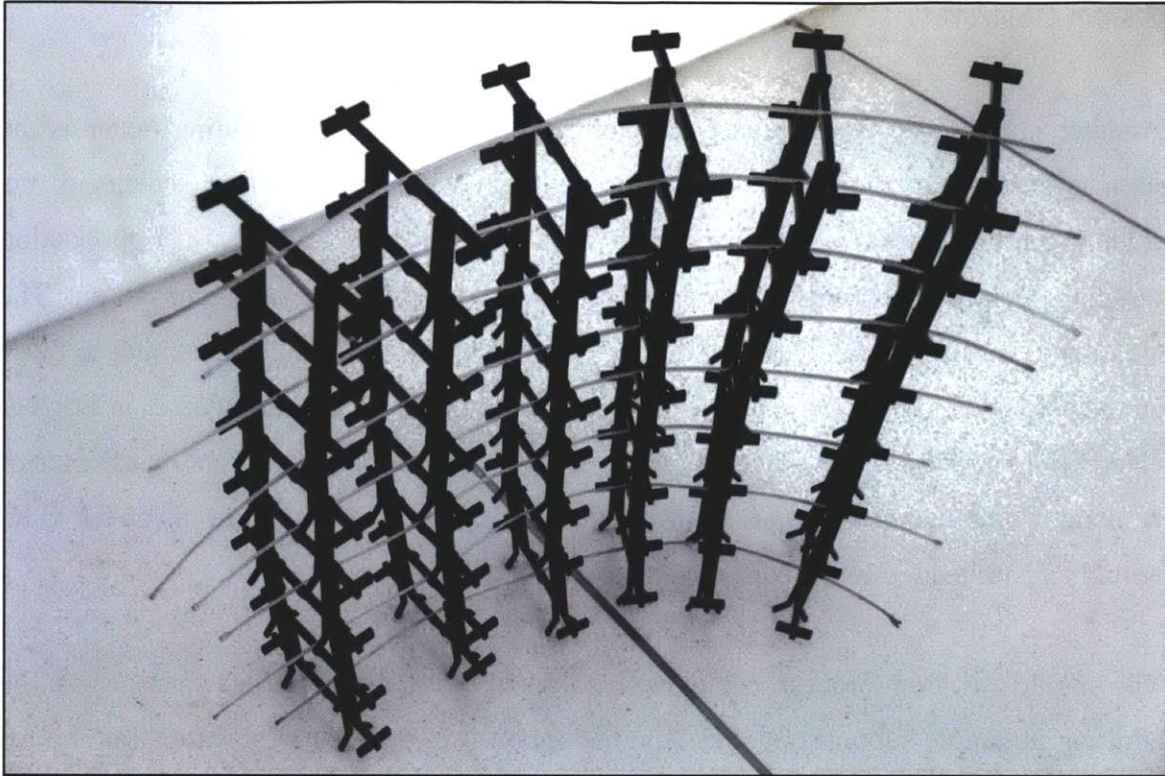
An example reinforcement system that could be integrated into the printed mould structure to serve as rebar for concrete, ties for attaching screws to the wall, and to improve structural strength of the mould.
